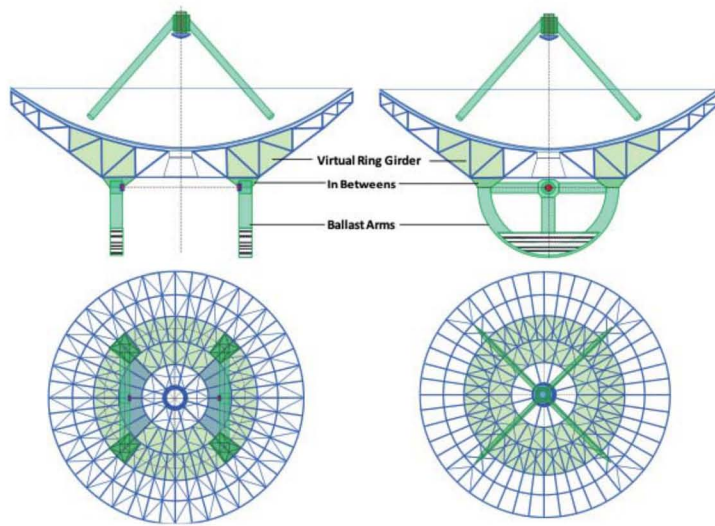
The design concept of the LMT reflector backup structure and its connection to the elevation structure at the corners of the ballast girders.
